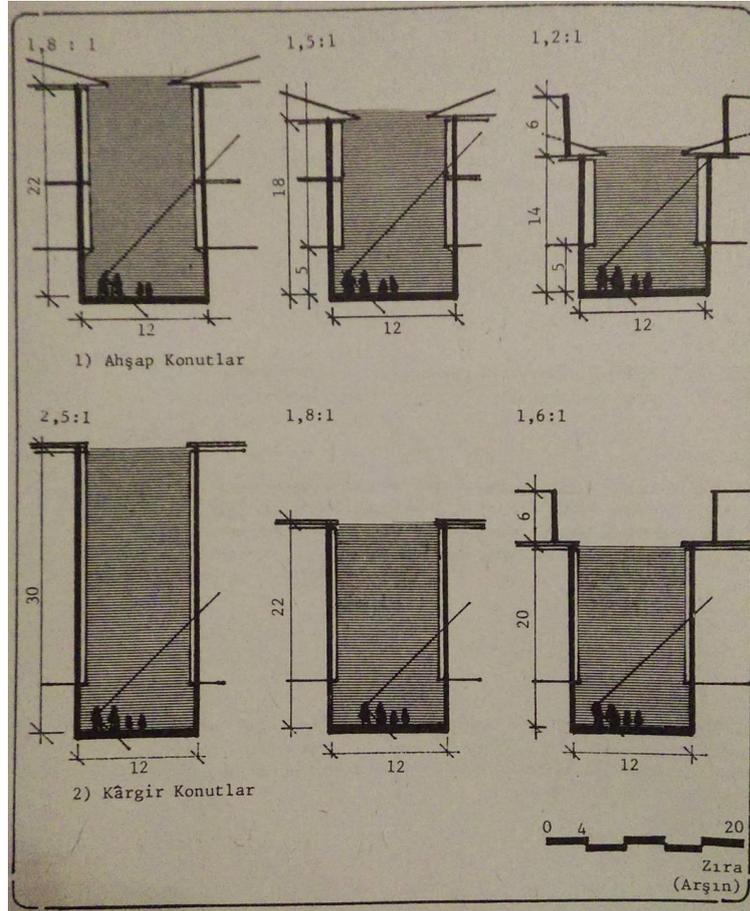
Drawings showing the rules on wooden frame and masonry building heights in Building Regulations (Ebniye Nizamnamesi) (Denel, 1982, p.80)
